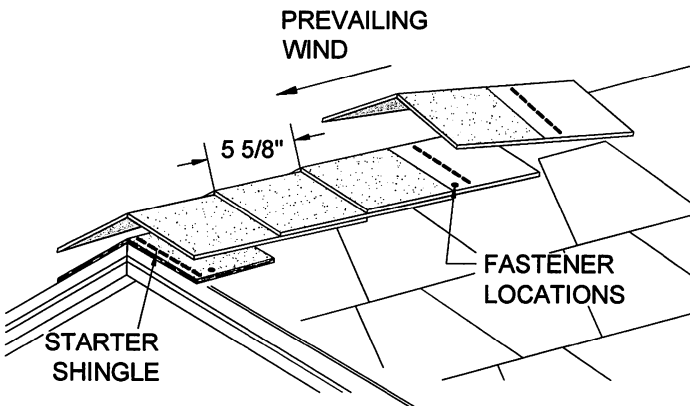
Placement and Fastening of RidgeFlex™ Shingles, Maintaining the 5 5/8" Exposure
